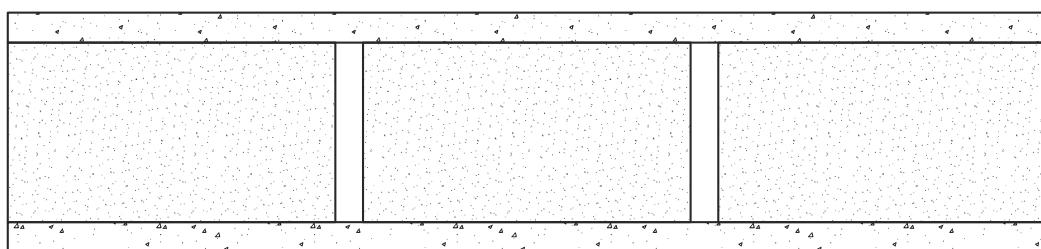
Single leaf of 220 mm brick masonry with 13 mm cement render on each face
